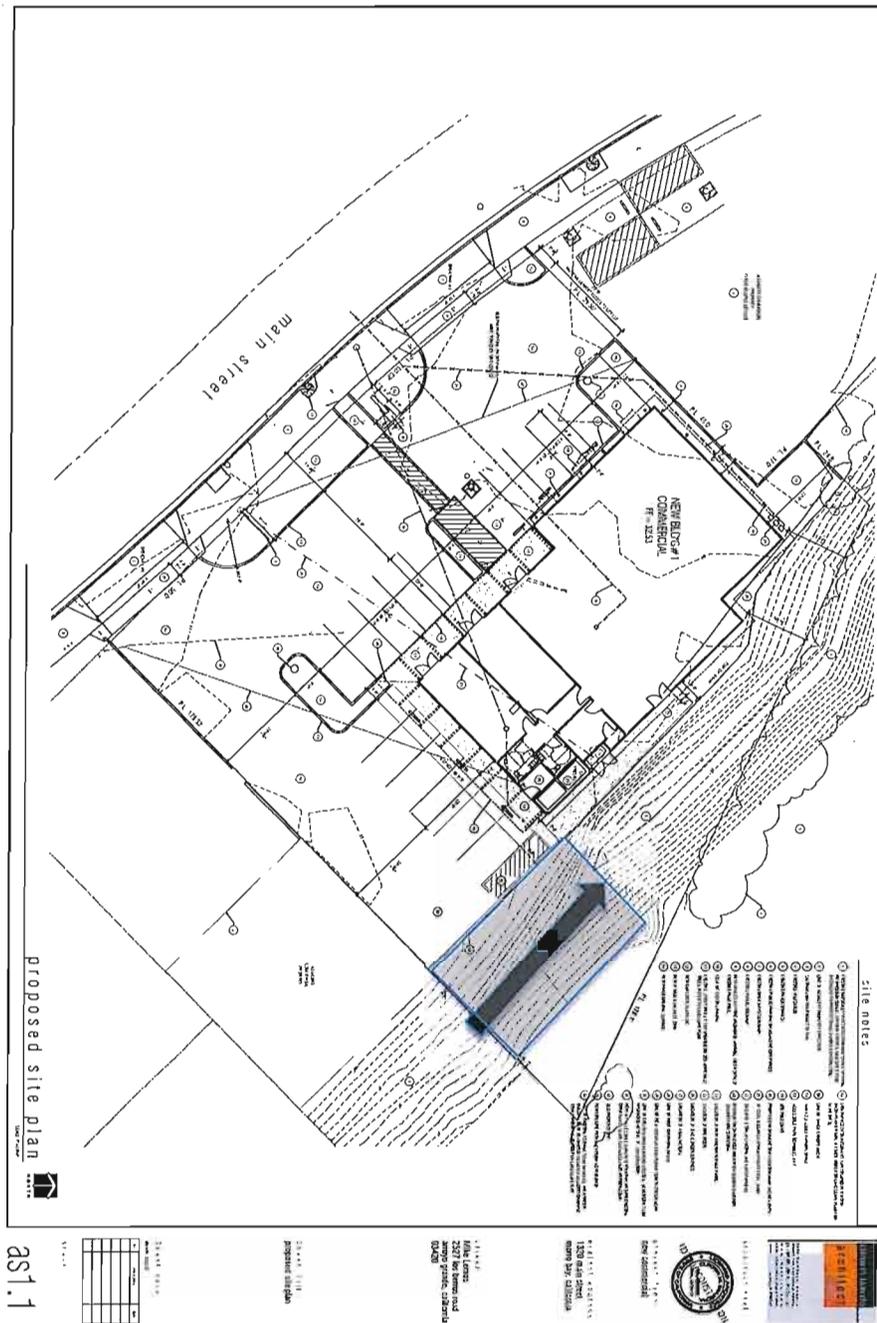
Proposed site plan for the Mike Lemos parcel located at 1320 Main Street, Morro Bay, CA showing the parcel boundaries and the proposed new building and parking areas. It also shows the estimated area of the new section of the drainage that will be reshaped after the storage building is removed (shaded area with black arrow). The owner will provide a larger version of this map.
